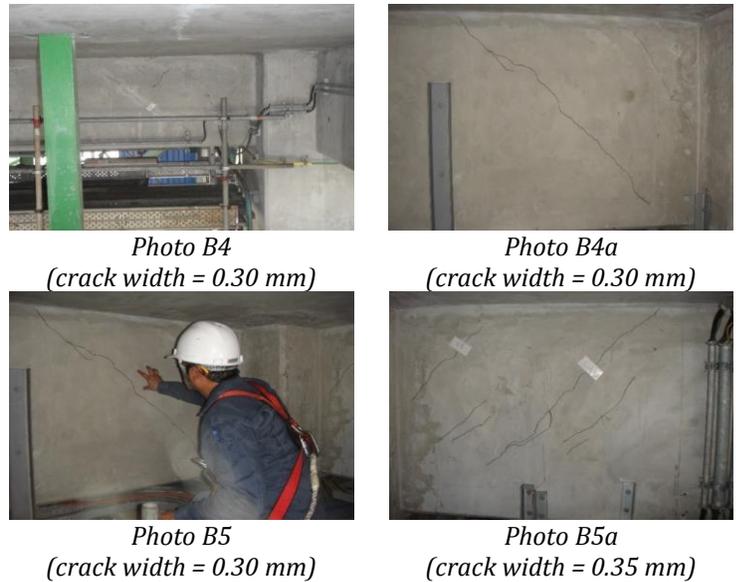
Location of shear cracks found in RC beams at the 2nd floor
